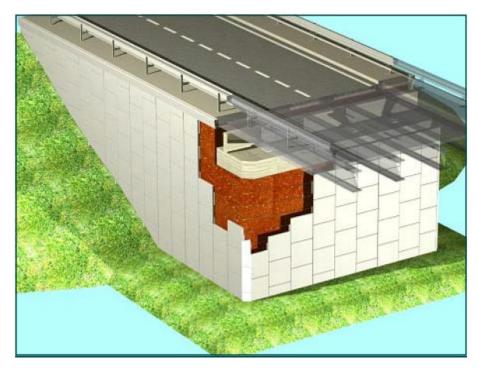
Macres system incorporated into a bridge abutment (Maccaferri, 2010)
